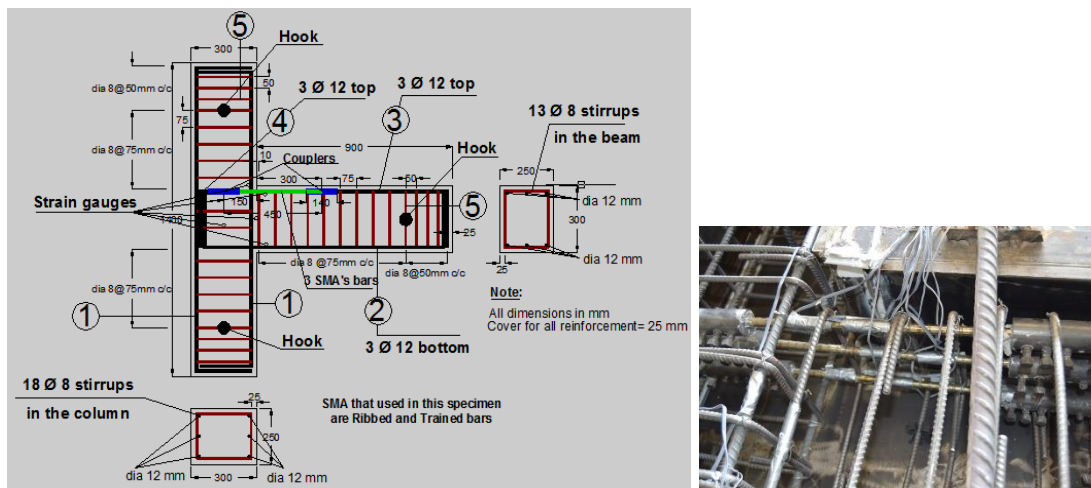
Details of steel reinforcement and SMA bars in BCJ specimen.
